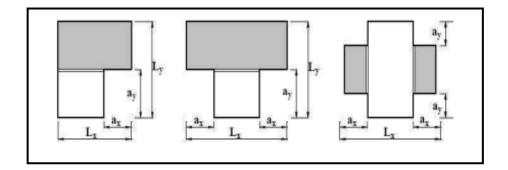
Dividing Building into Several Sections* Source: (*TBEC*, 2018)
